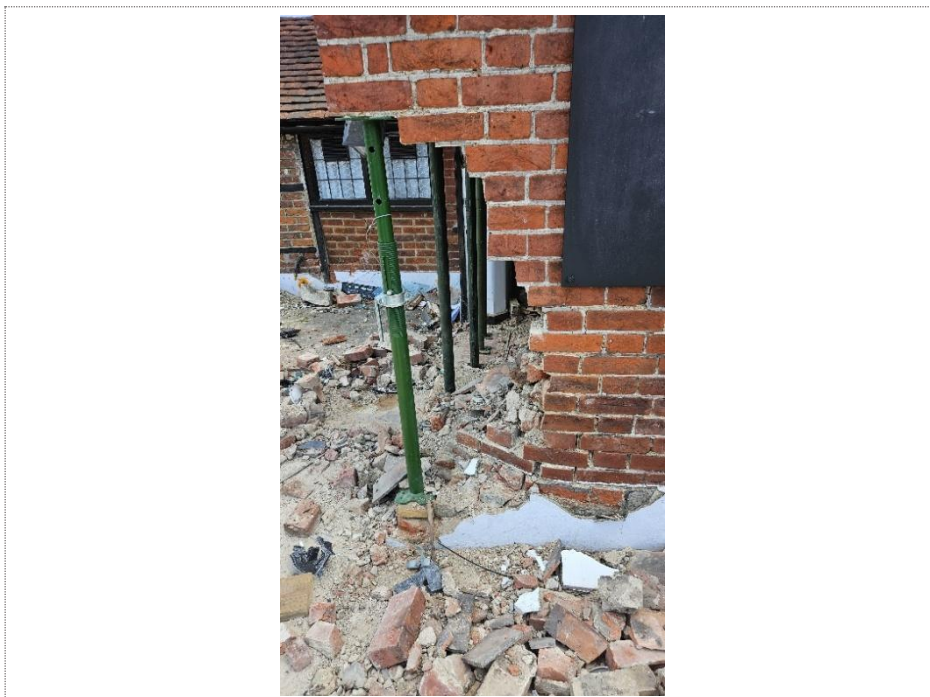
Image showing close up of the damage seen on the right-hand side elevation.
